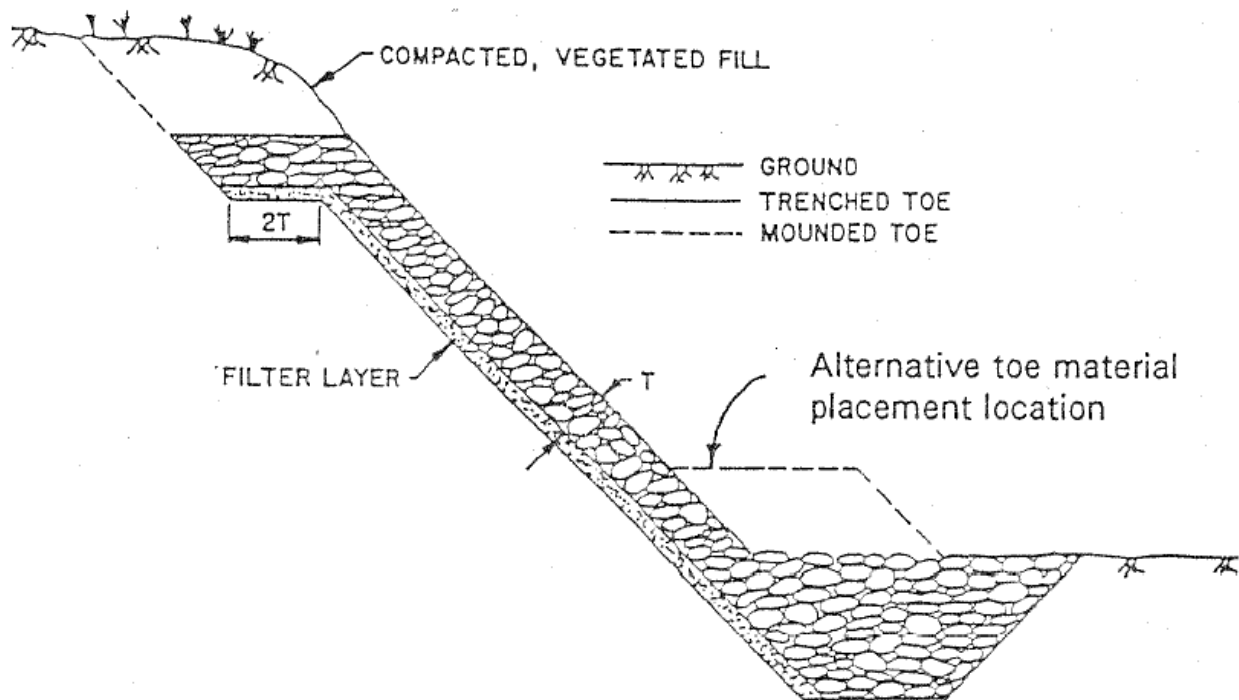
Typical Riprap Installation: End View (Bank Protection Only)
